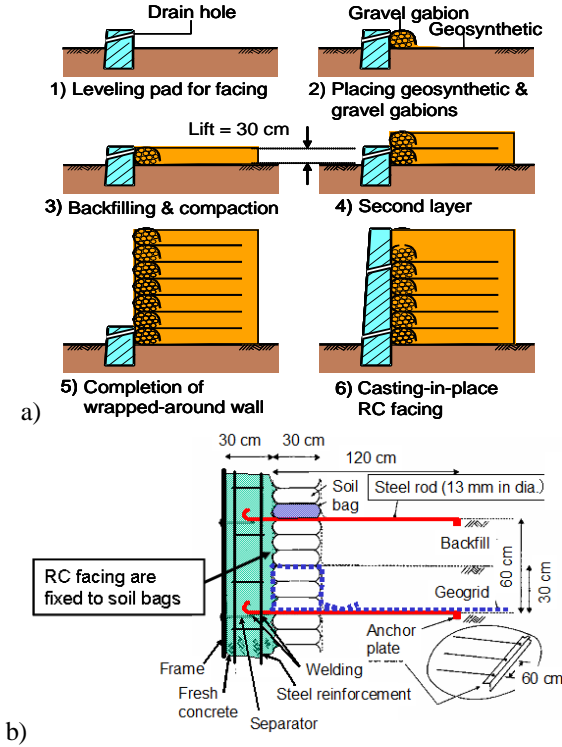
Staged construction of GRS RW: a) construction steps; and b) details of connection between the facing and the reinforced backfill (Tatsuoka et al., 1997, 2007).
